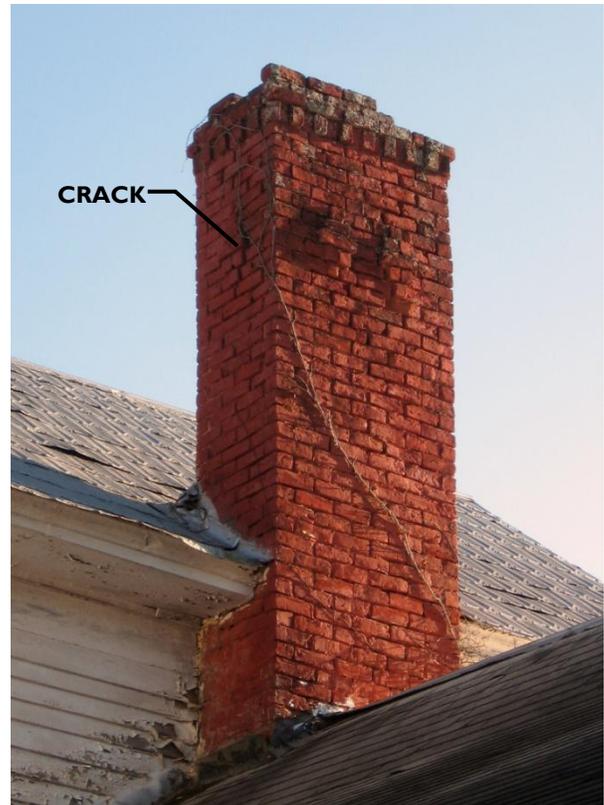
Long House. Chimney at north wall of west wing. Note crack in east face and severe erosion of mortar joints. Deterioration of masonry and flashing has caused damage to wall framing, ceiling and wall paneling at SW Bedroom 202.
